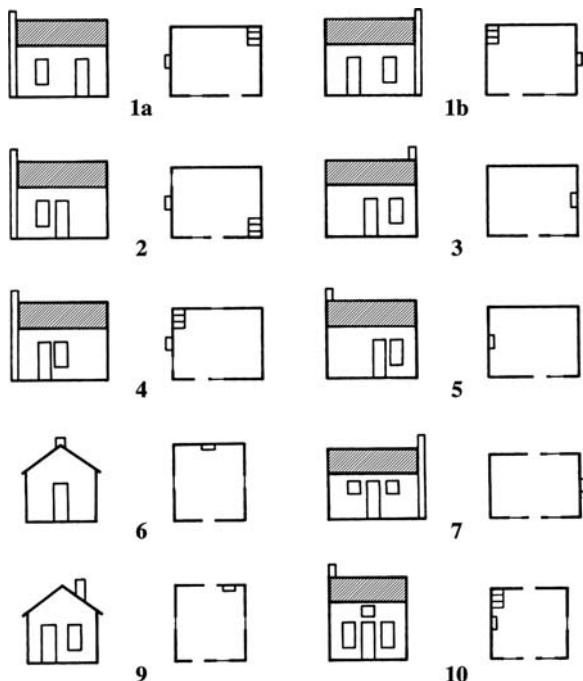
Facades and floor plans of classes of one-story, single-pen houses and story-and-a-half, single-pen houses created by paradigmatic classification of structures in the central Salt River valley of northeastern Missouri (after O'Brien et al., 1980; from O'Brien and Lyman, 2000:Fig. 1)
